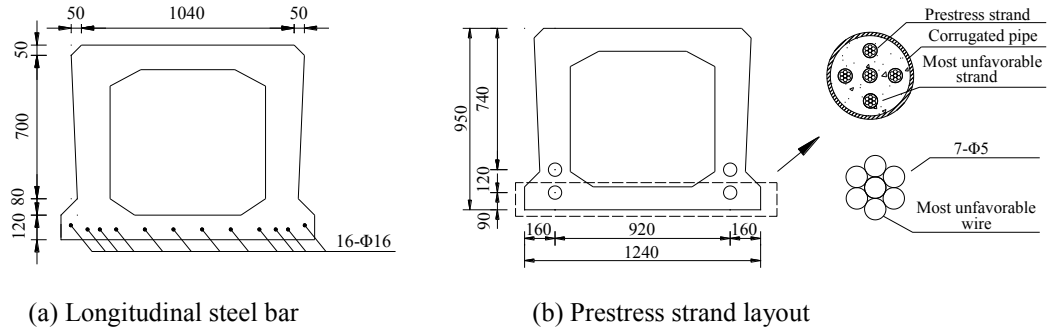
Longitudinal steel bar and prestress strand layout (Unit: mm)
